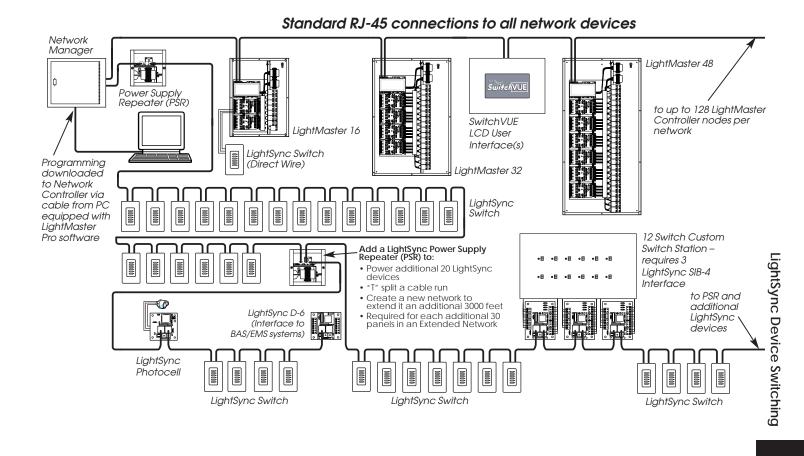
Sample Extended Network LightSync Switching Layout
